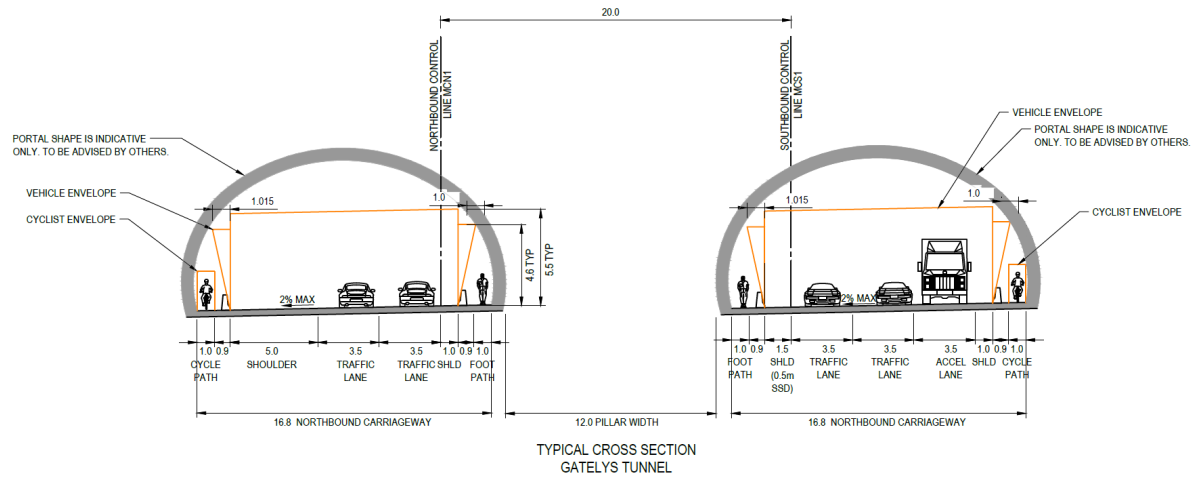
Tunnel cross section for the Gatelys Road Tunnel (subject to detailed design)
